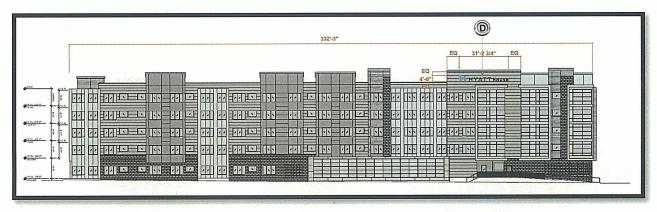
Freeway Oriented Wall Sign (Facing I-280)
